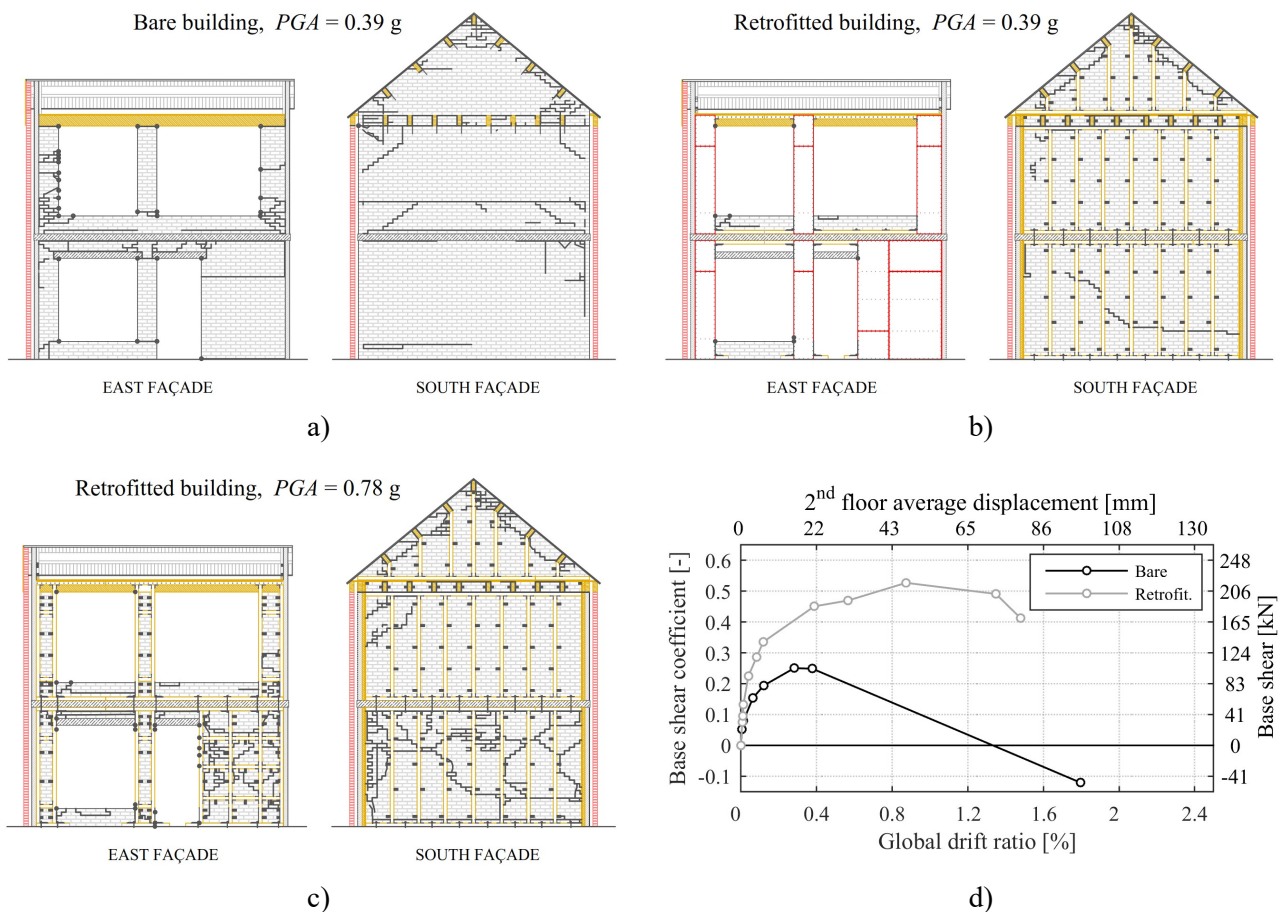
Damage patterns: a) bare building at ultimate conditions; b) retrofitted building after shaking with the last run performed for the bare specimen; c) retrofitted building at ultimate conditions; d) bare and retrofitted specimen backbone curves.
